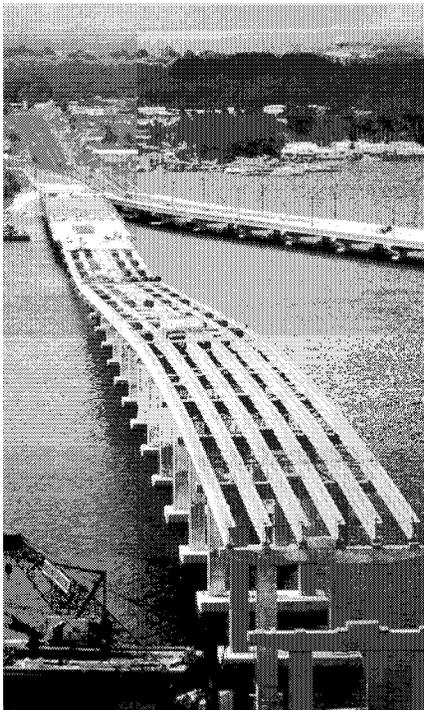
View of Prefabricated Substructure and Girders of Edison Bridge
